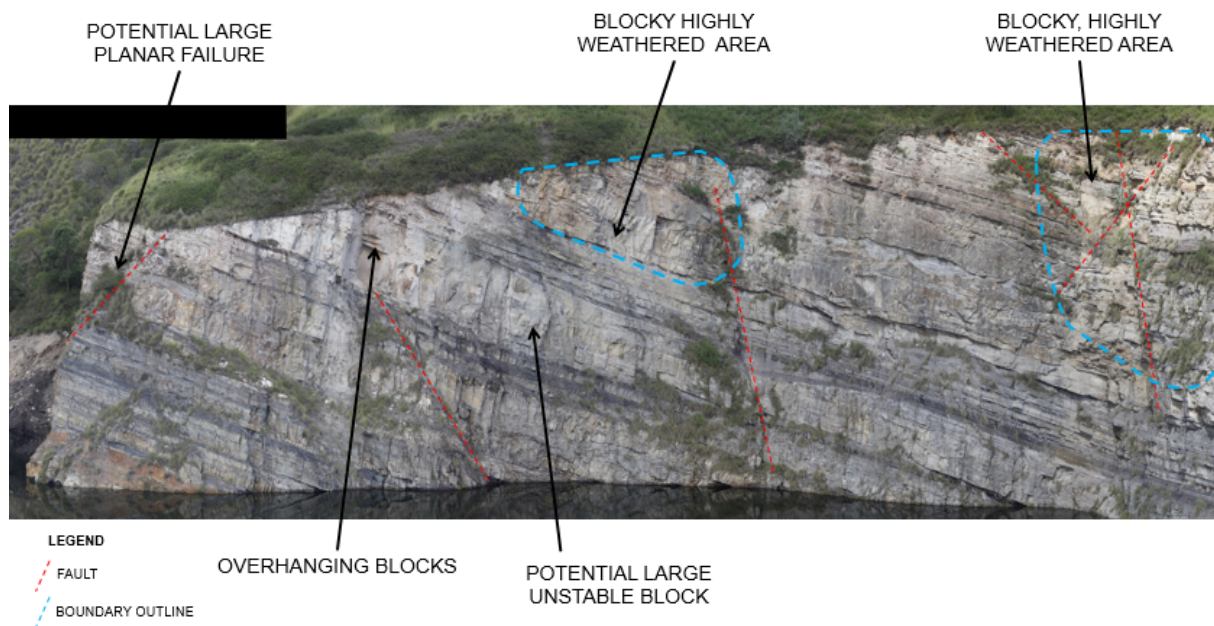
Photogrammetry of highwall showing some potential failure mechanisms
